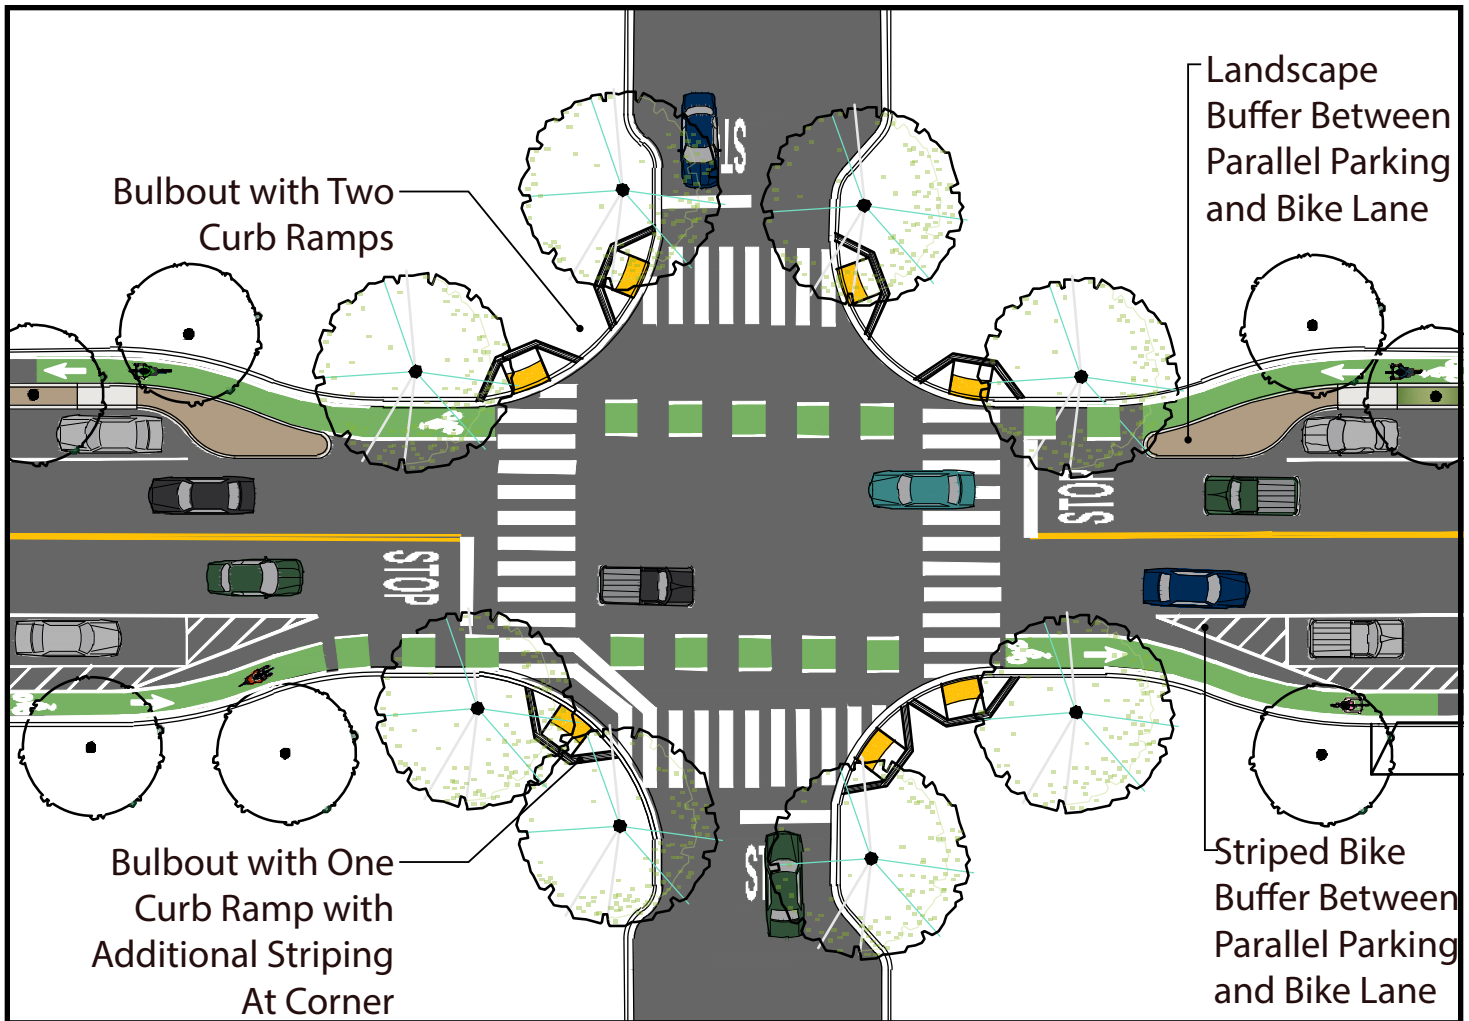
, Protected Bike Lane and Cycle track, On-Street Parallel Parking and Bulbouts at the Intersection
